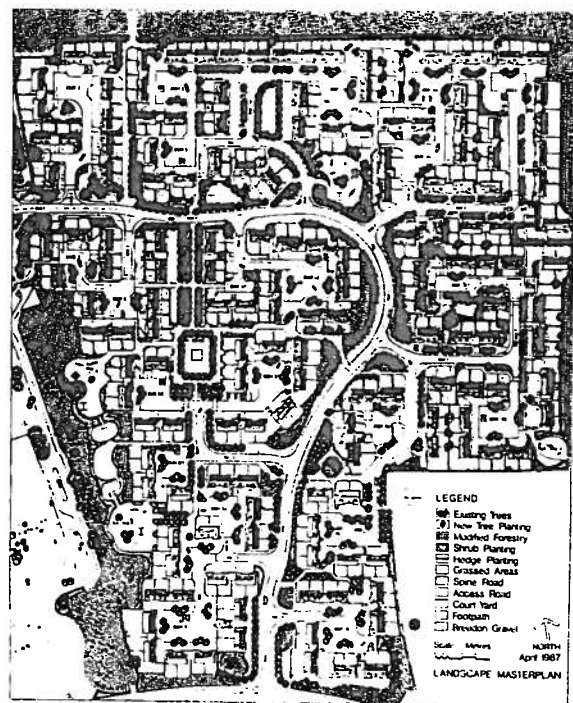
Landscaped scheme for 326 dwellings on exposed site (PSA).
